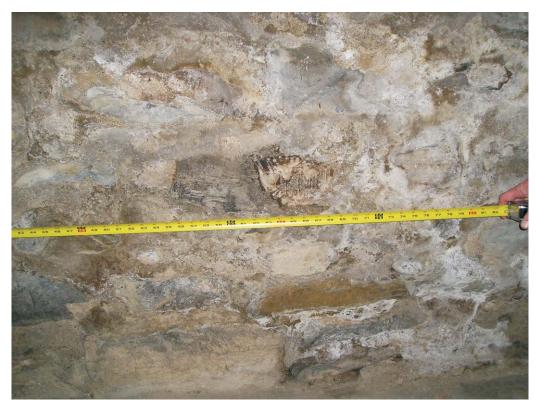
Stone #1 after sampling. Located approximately 5 feet from the wooden partition wall.
